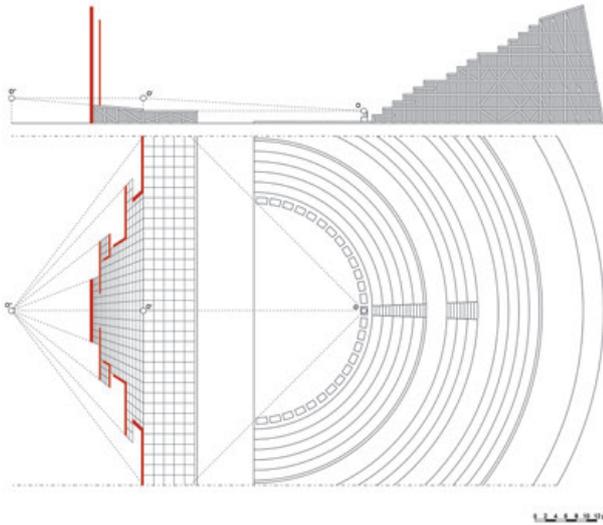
Reconstruction in plan and elevation of Sebastiano Serlio's temporary theater [Serlio 1545] (drawing by author, 2024).
